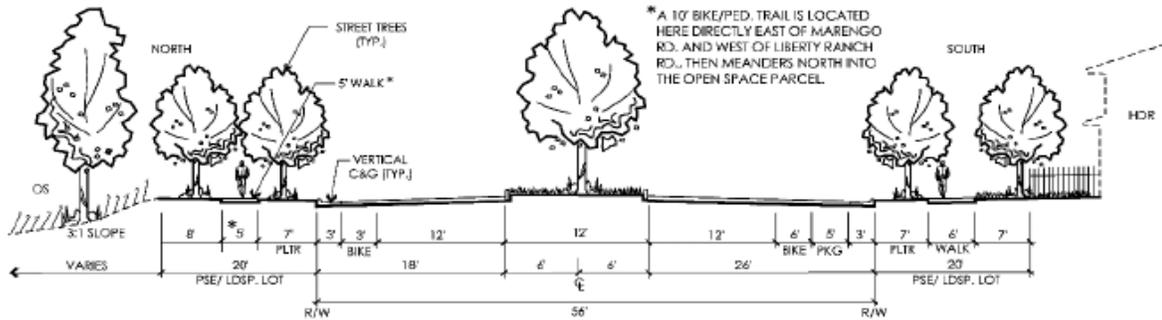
Walnut Avenue - 2 Lanes West of Liberty Ranch Road
